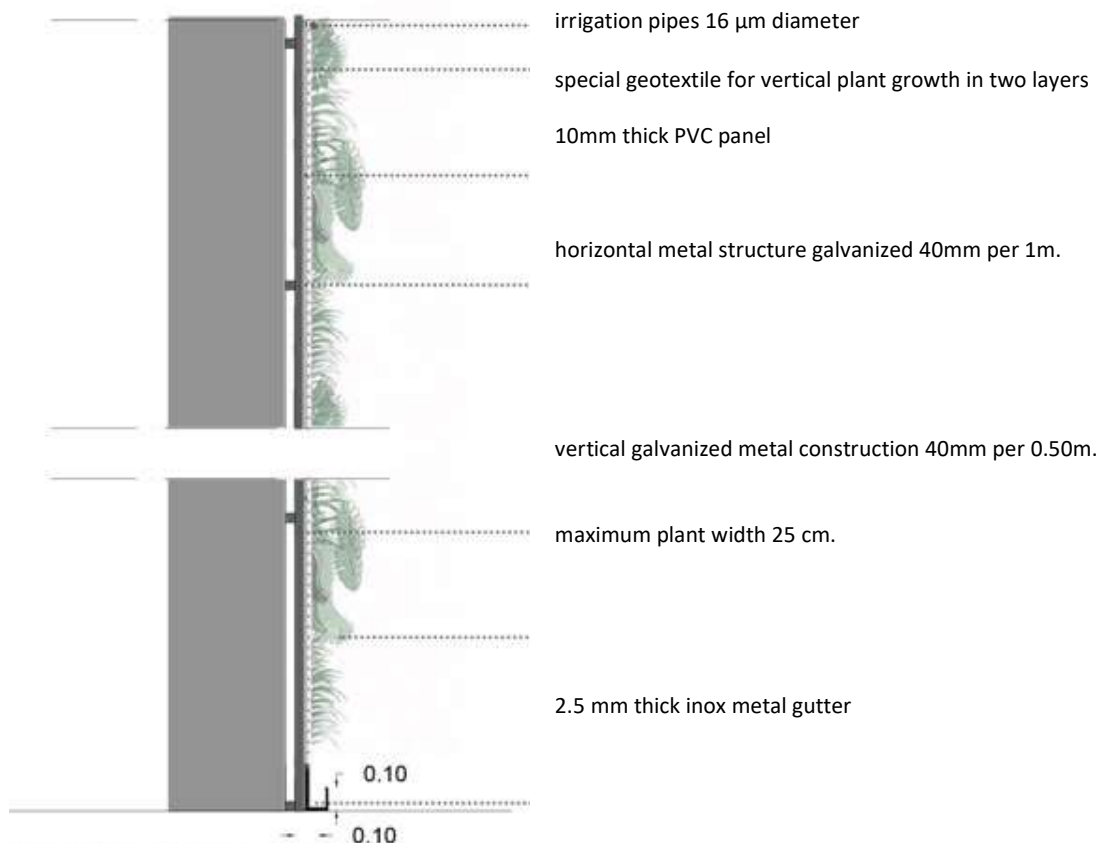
Section of green wall (Vita Verde Vertical Garden)
